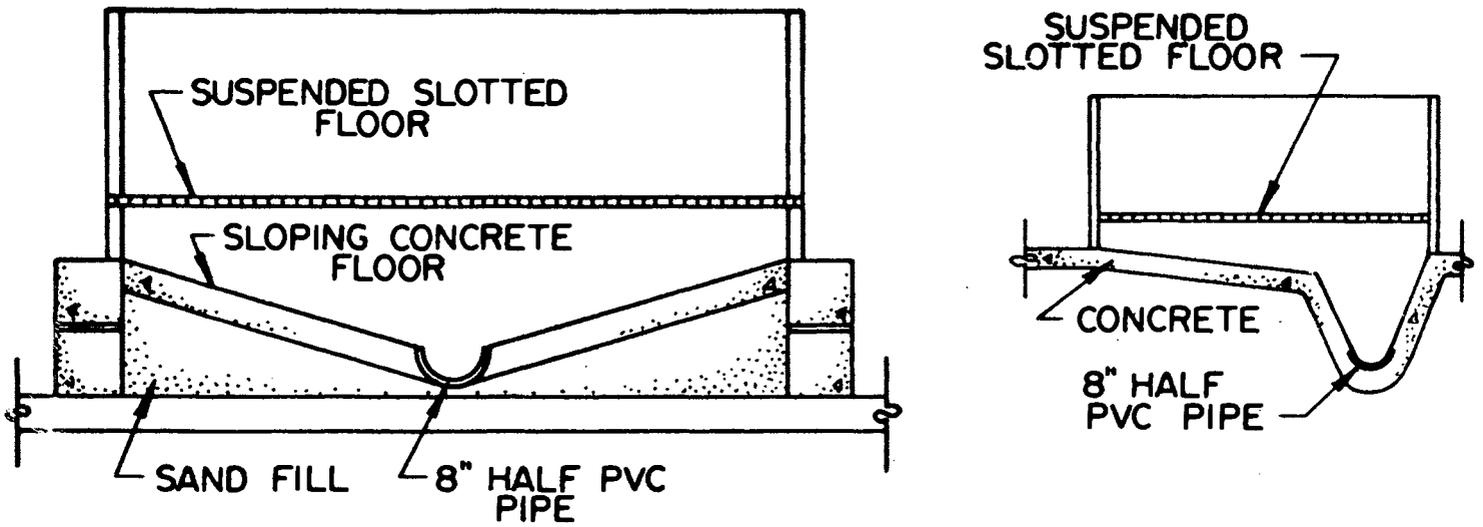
V-shaped gutter (left) and J-shaped gutter (right) under suspended slatted floors.
